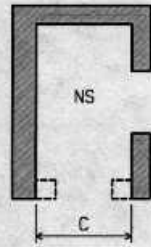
HS BENEATH AN INTERNAL STAIRCASE
